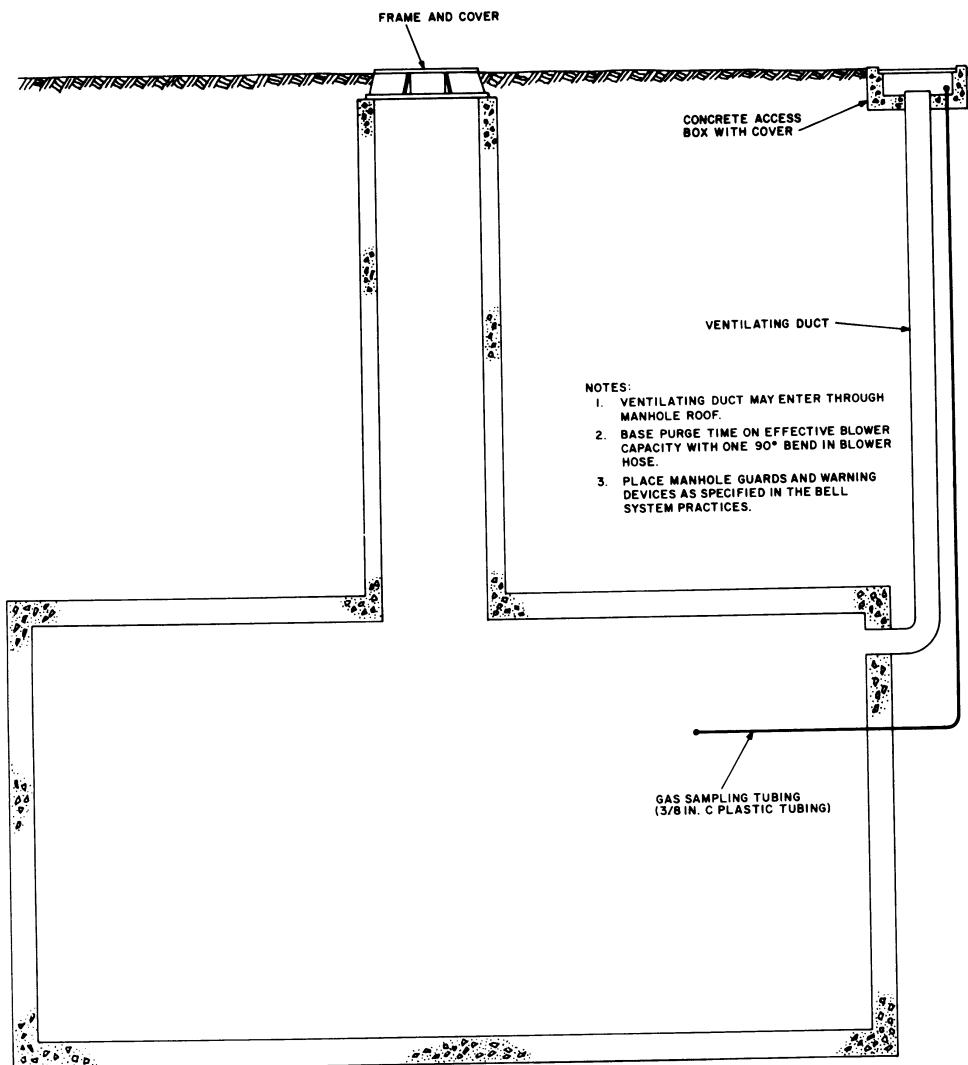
Deep Neck Manhole With Permanent Ventilating Duct Installed Adjacent to Manhole
